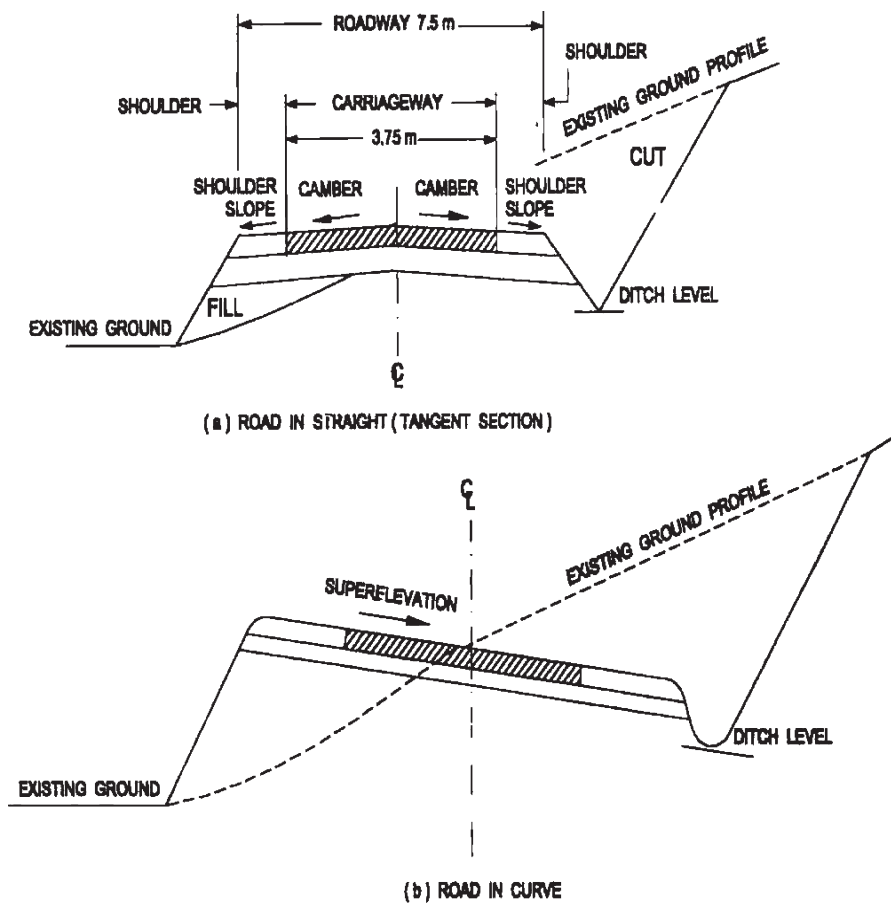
Typical Cross-section in Plain and Rolling Terrain
